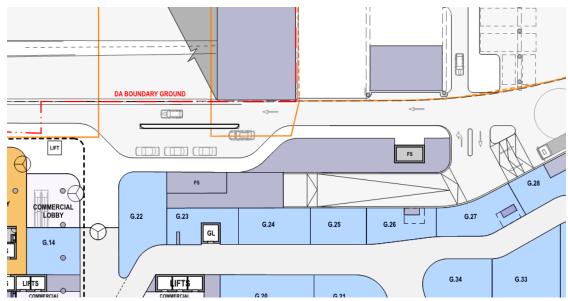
Residential Drop-off Zone and Basement Car Park Entry/Exit at Ground Level
